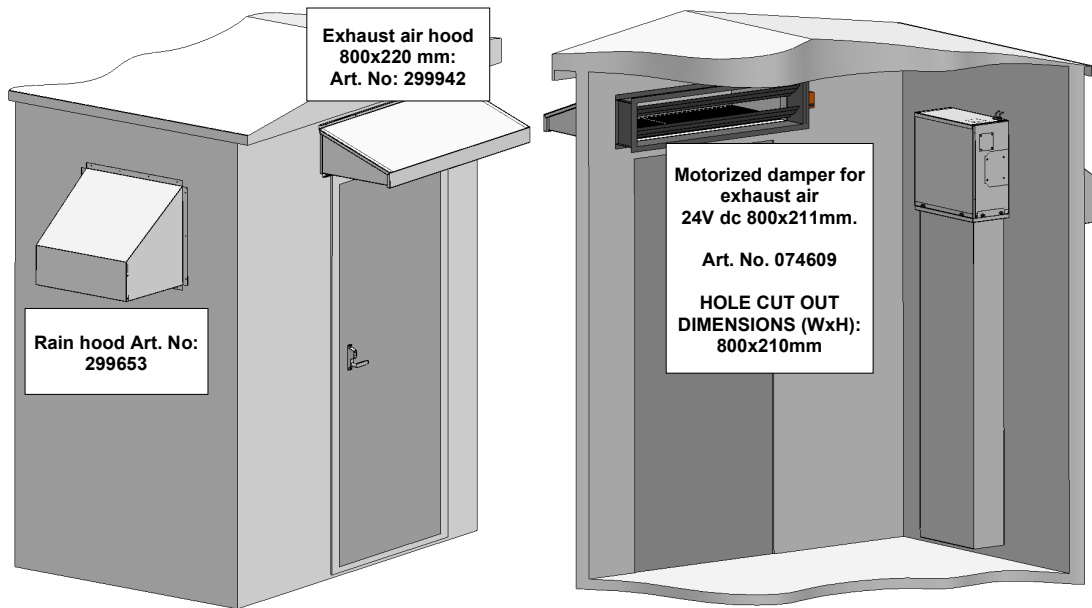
Illustration DFC 450 The drawings below illustrate the dimensions of the DFC 450.
